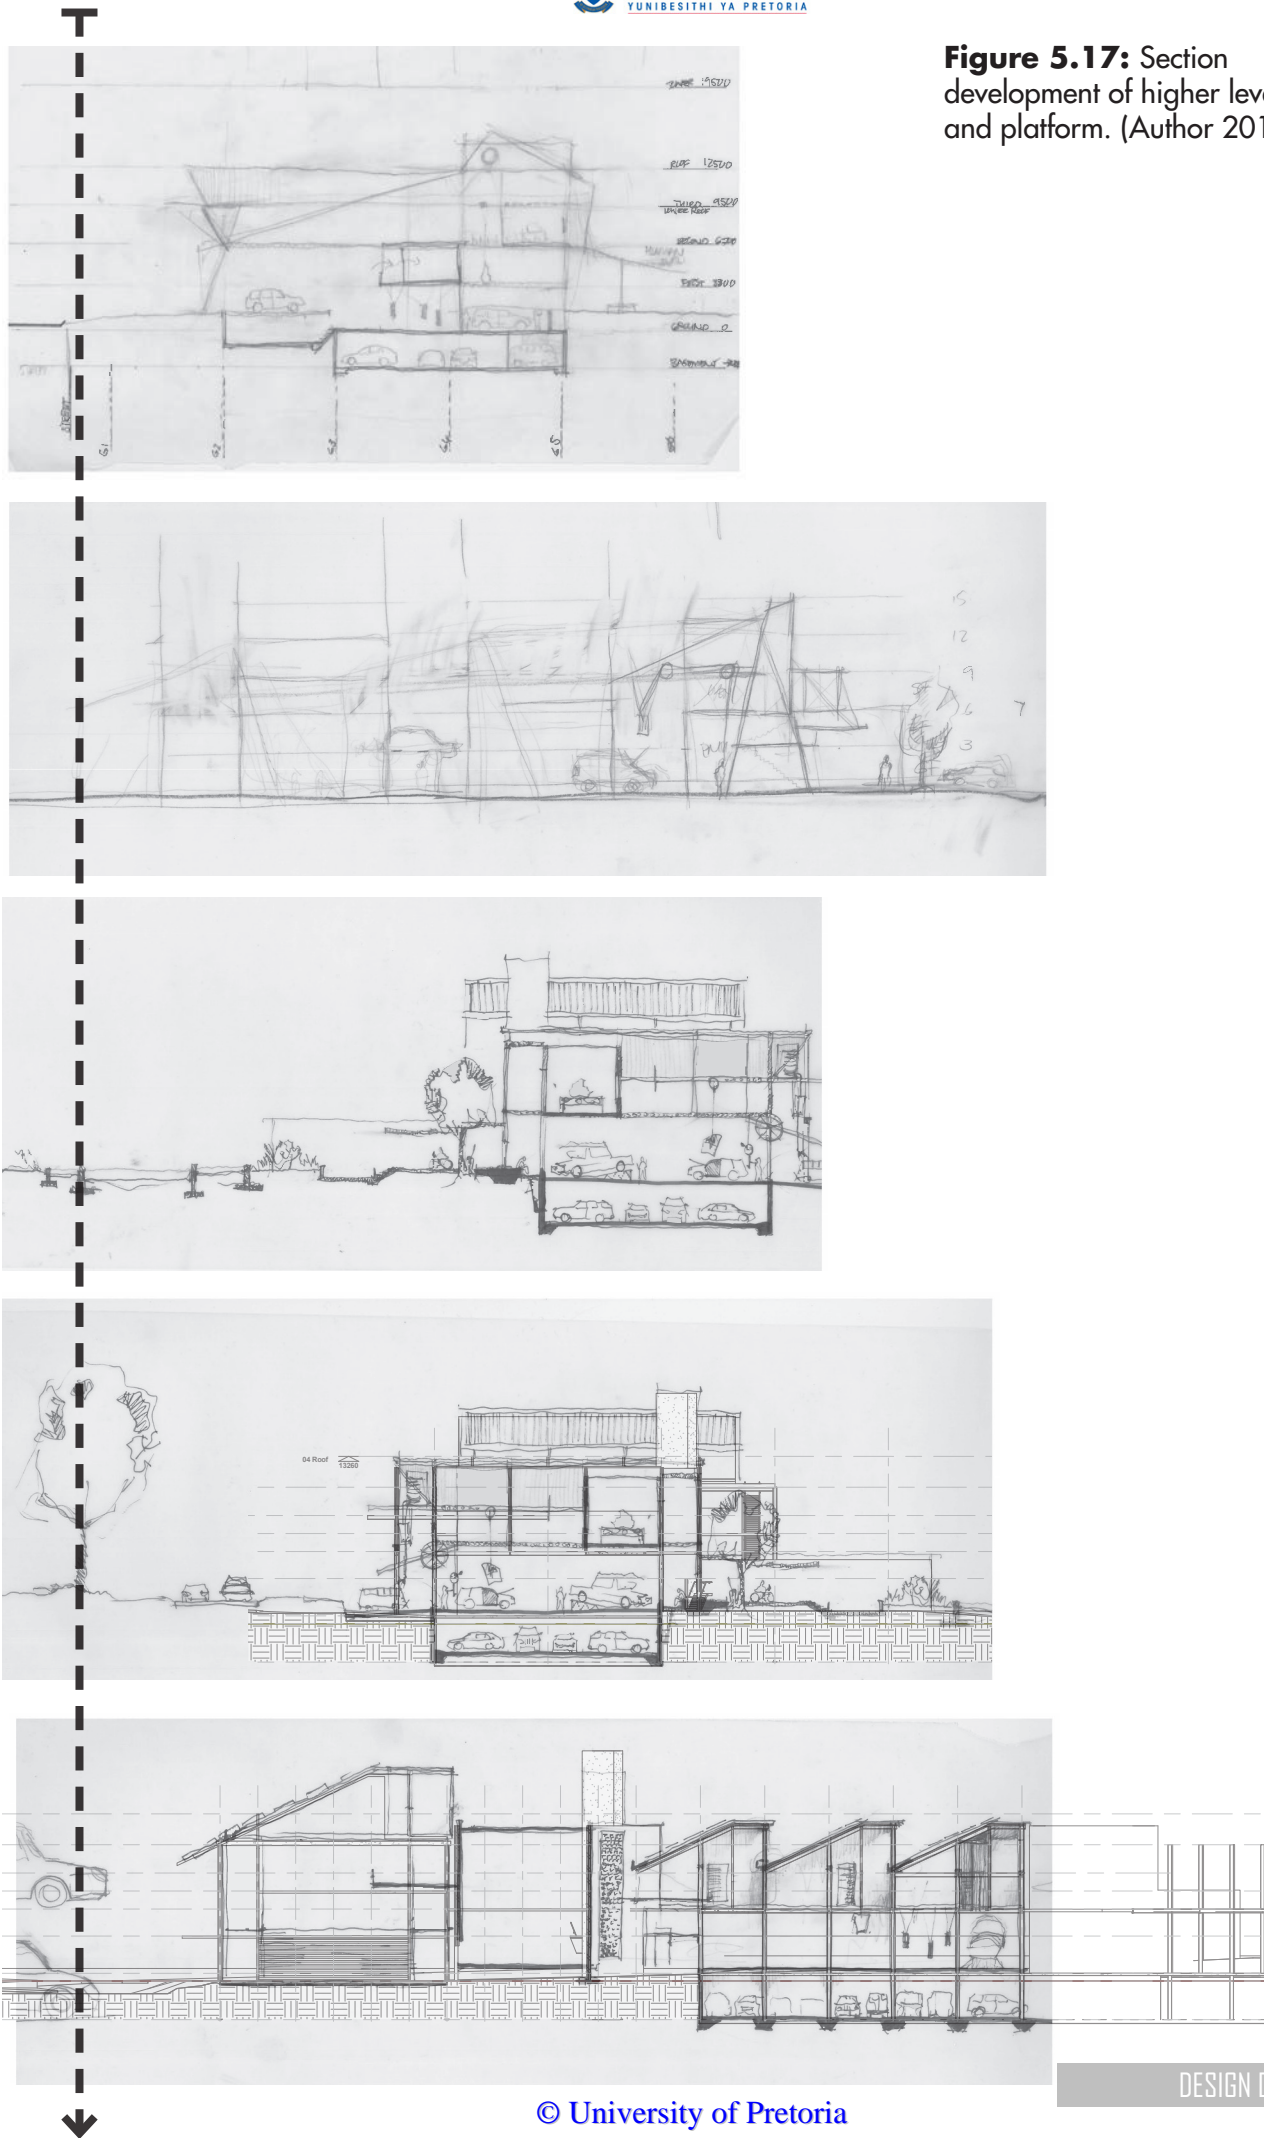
Section development of higher level roof and platform. (Author 2017)
